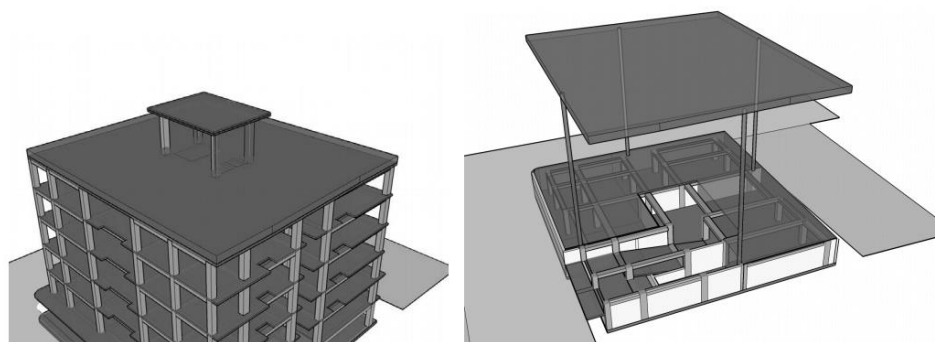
Rooftop catchment of a concrete structure (left) and catchment and underground storage tank system illustration (right).
